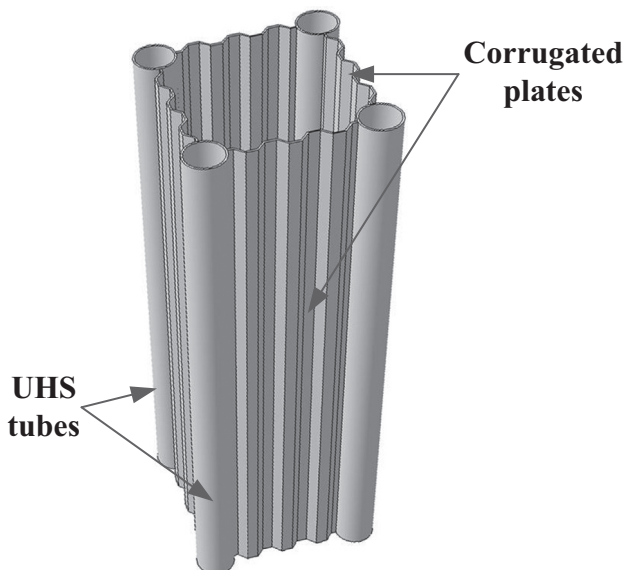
A schematic drawing of proposed hollow corrugated column.
